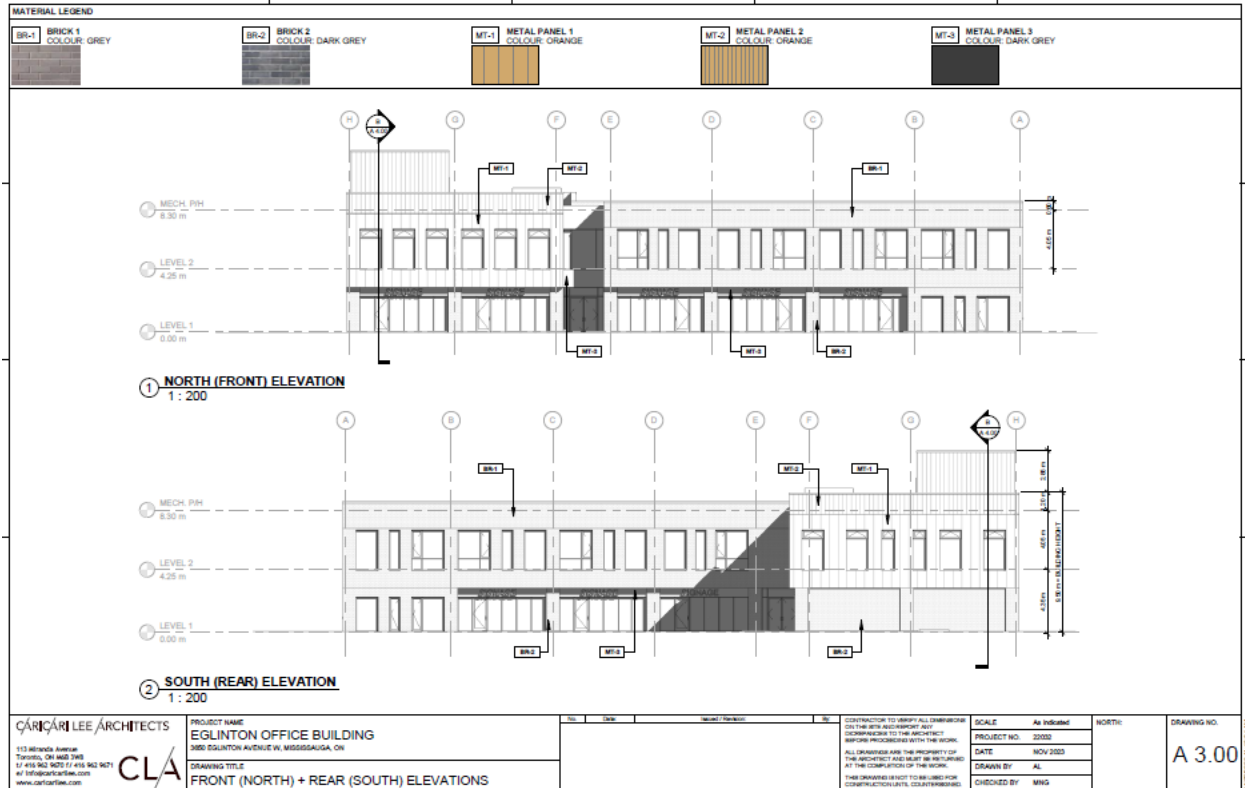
North and South Elevations. (Plan from Owner, November 2023.)
